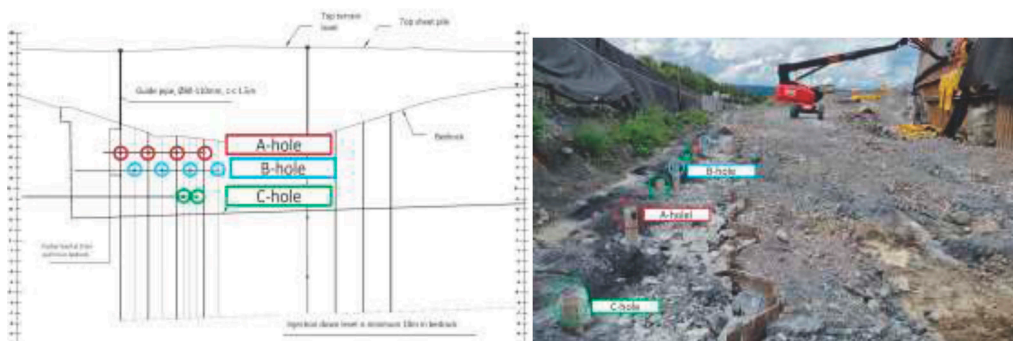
Illustration showing grouting holes with split-spacing procedure and photo of drilled casings for grout holes.
